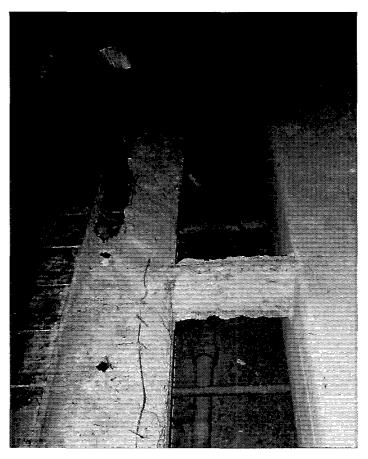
Void underneath concrete removal area, Building 84A UL#01
